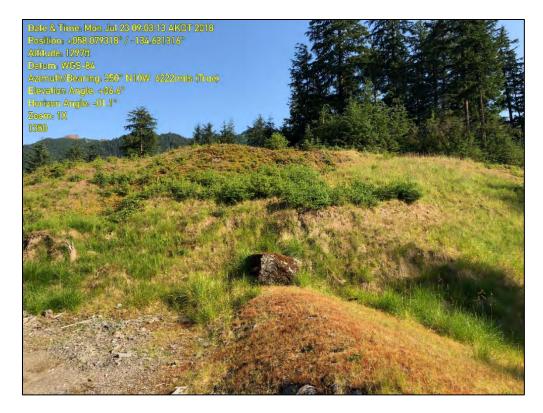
Pond area above the Sand Pit Dam (looking north).
